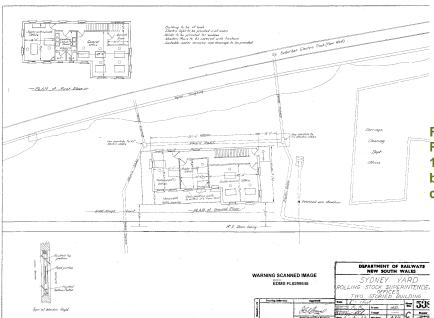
Preliminary plan of new Rolling Stock Superintendent's Office in 1944, before extension of building to as built. Note signal troughing and electric cabling indicated on map.
